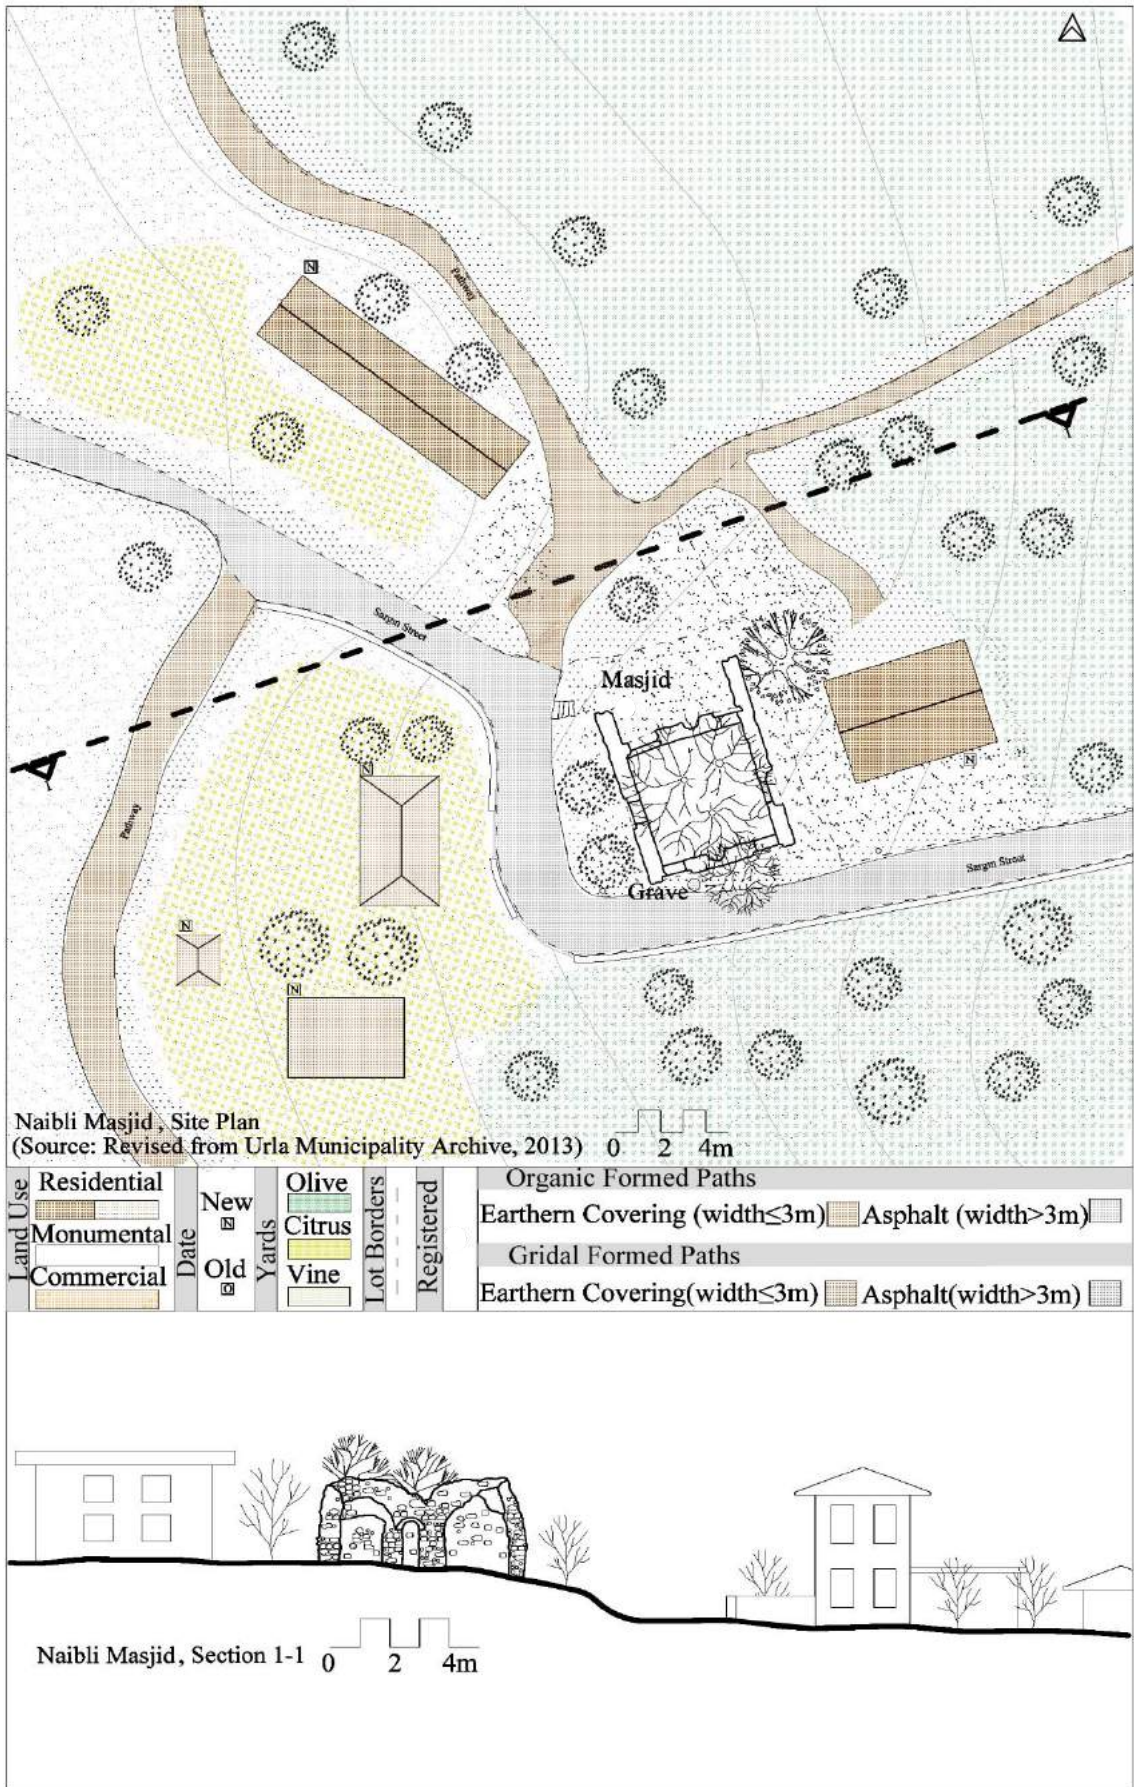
Site plan and silhouette section, Naibli Masjid
